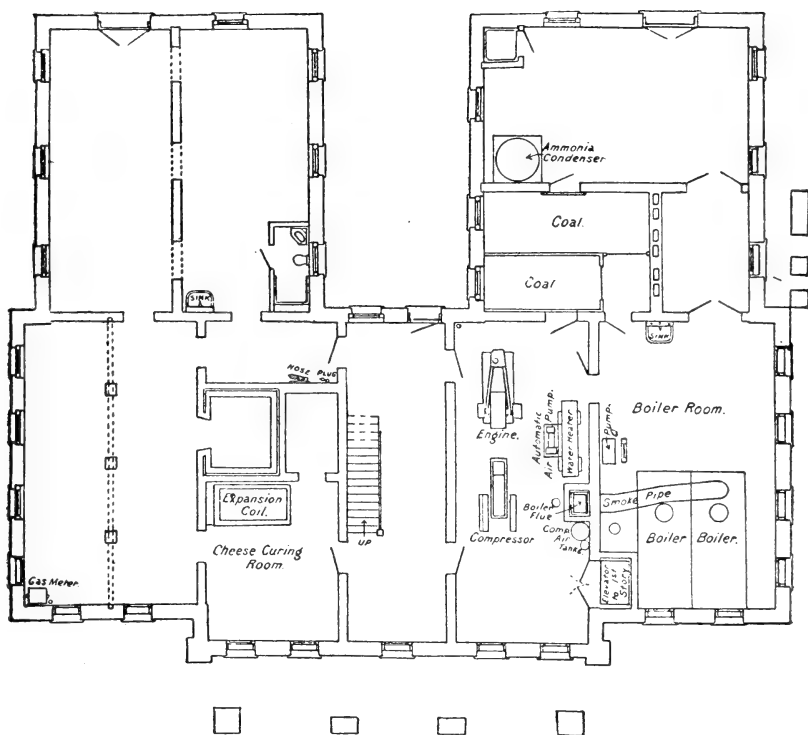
BASEMENT PLAN OF BIOLOGICAL AND DAIRY BUILDING.
